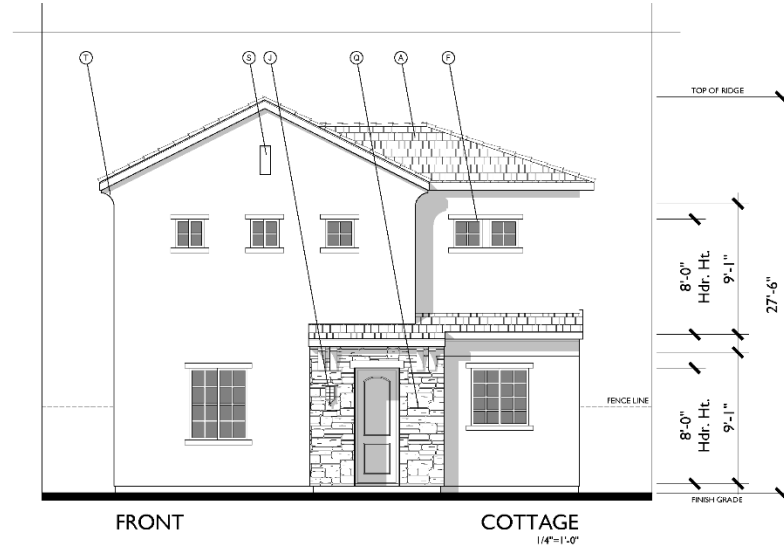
Cottage Elevation (Unique Condition)- Cluster Plan 1
